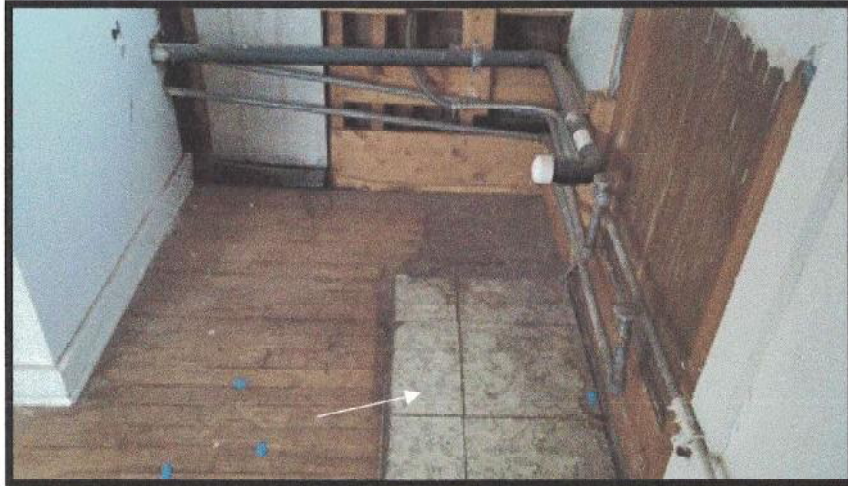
Upper east apartment contains 12" x 12" vinyl floor tiles tested positive for asbestos (arrow). Viewing down, and to the west.
